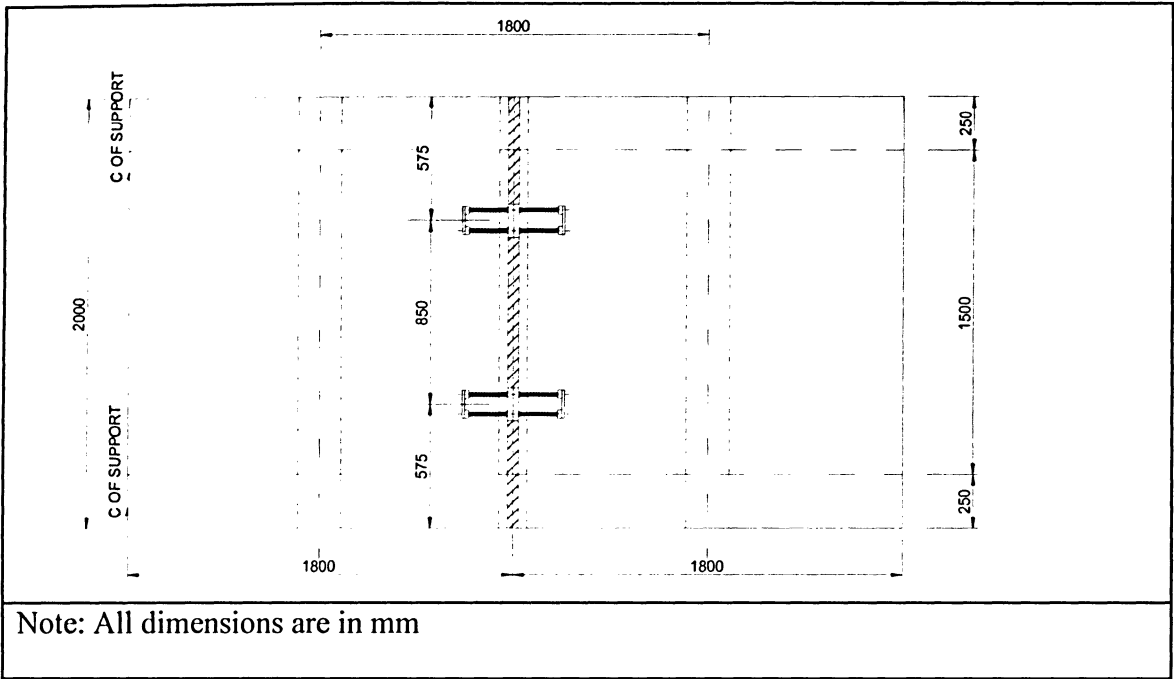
(a) Plan of Location of Bolted Connection for Model M4
